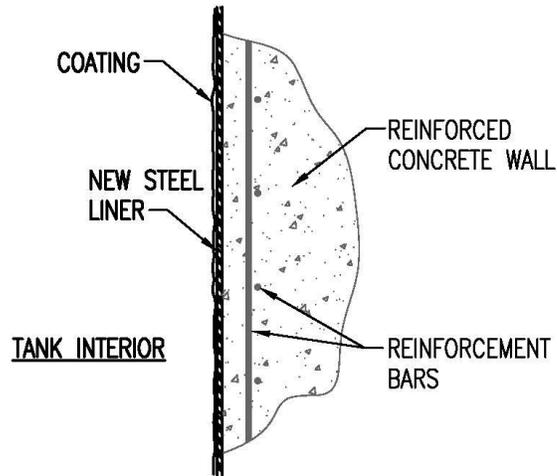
Tank Upgrade Alternative 1D - Typical Wall Section
